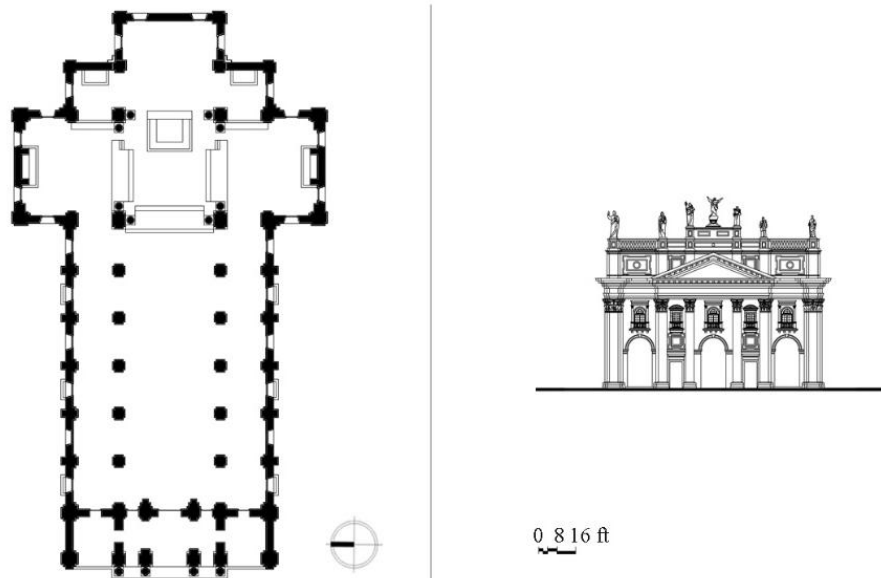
Floor plan and main façade of St. Lucia's Cathedral, Kotahene
